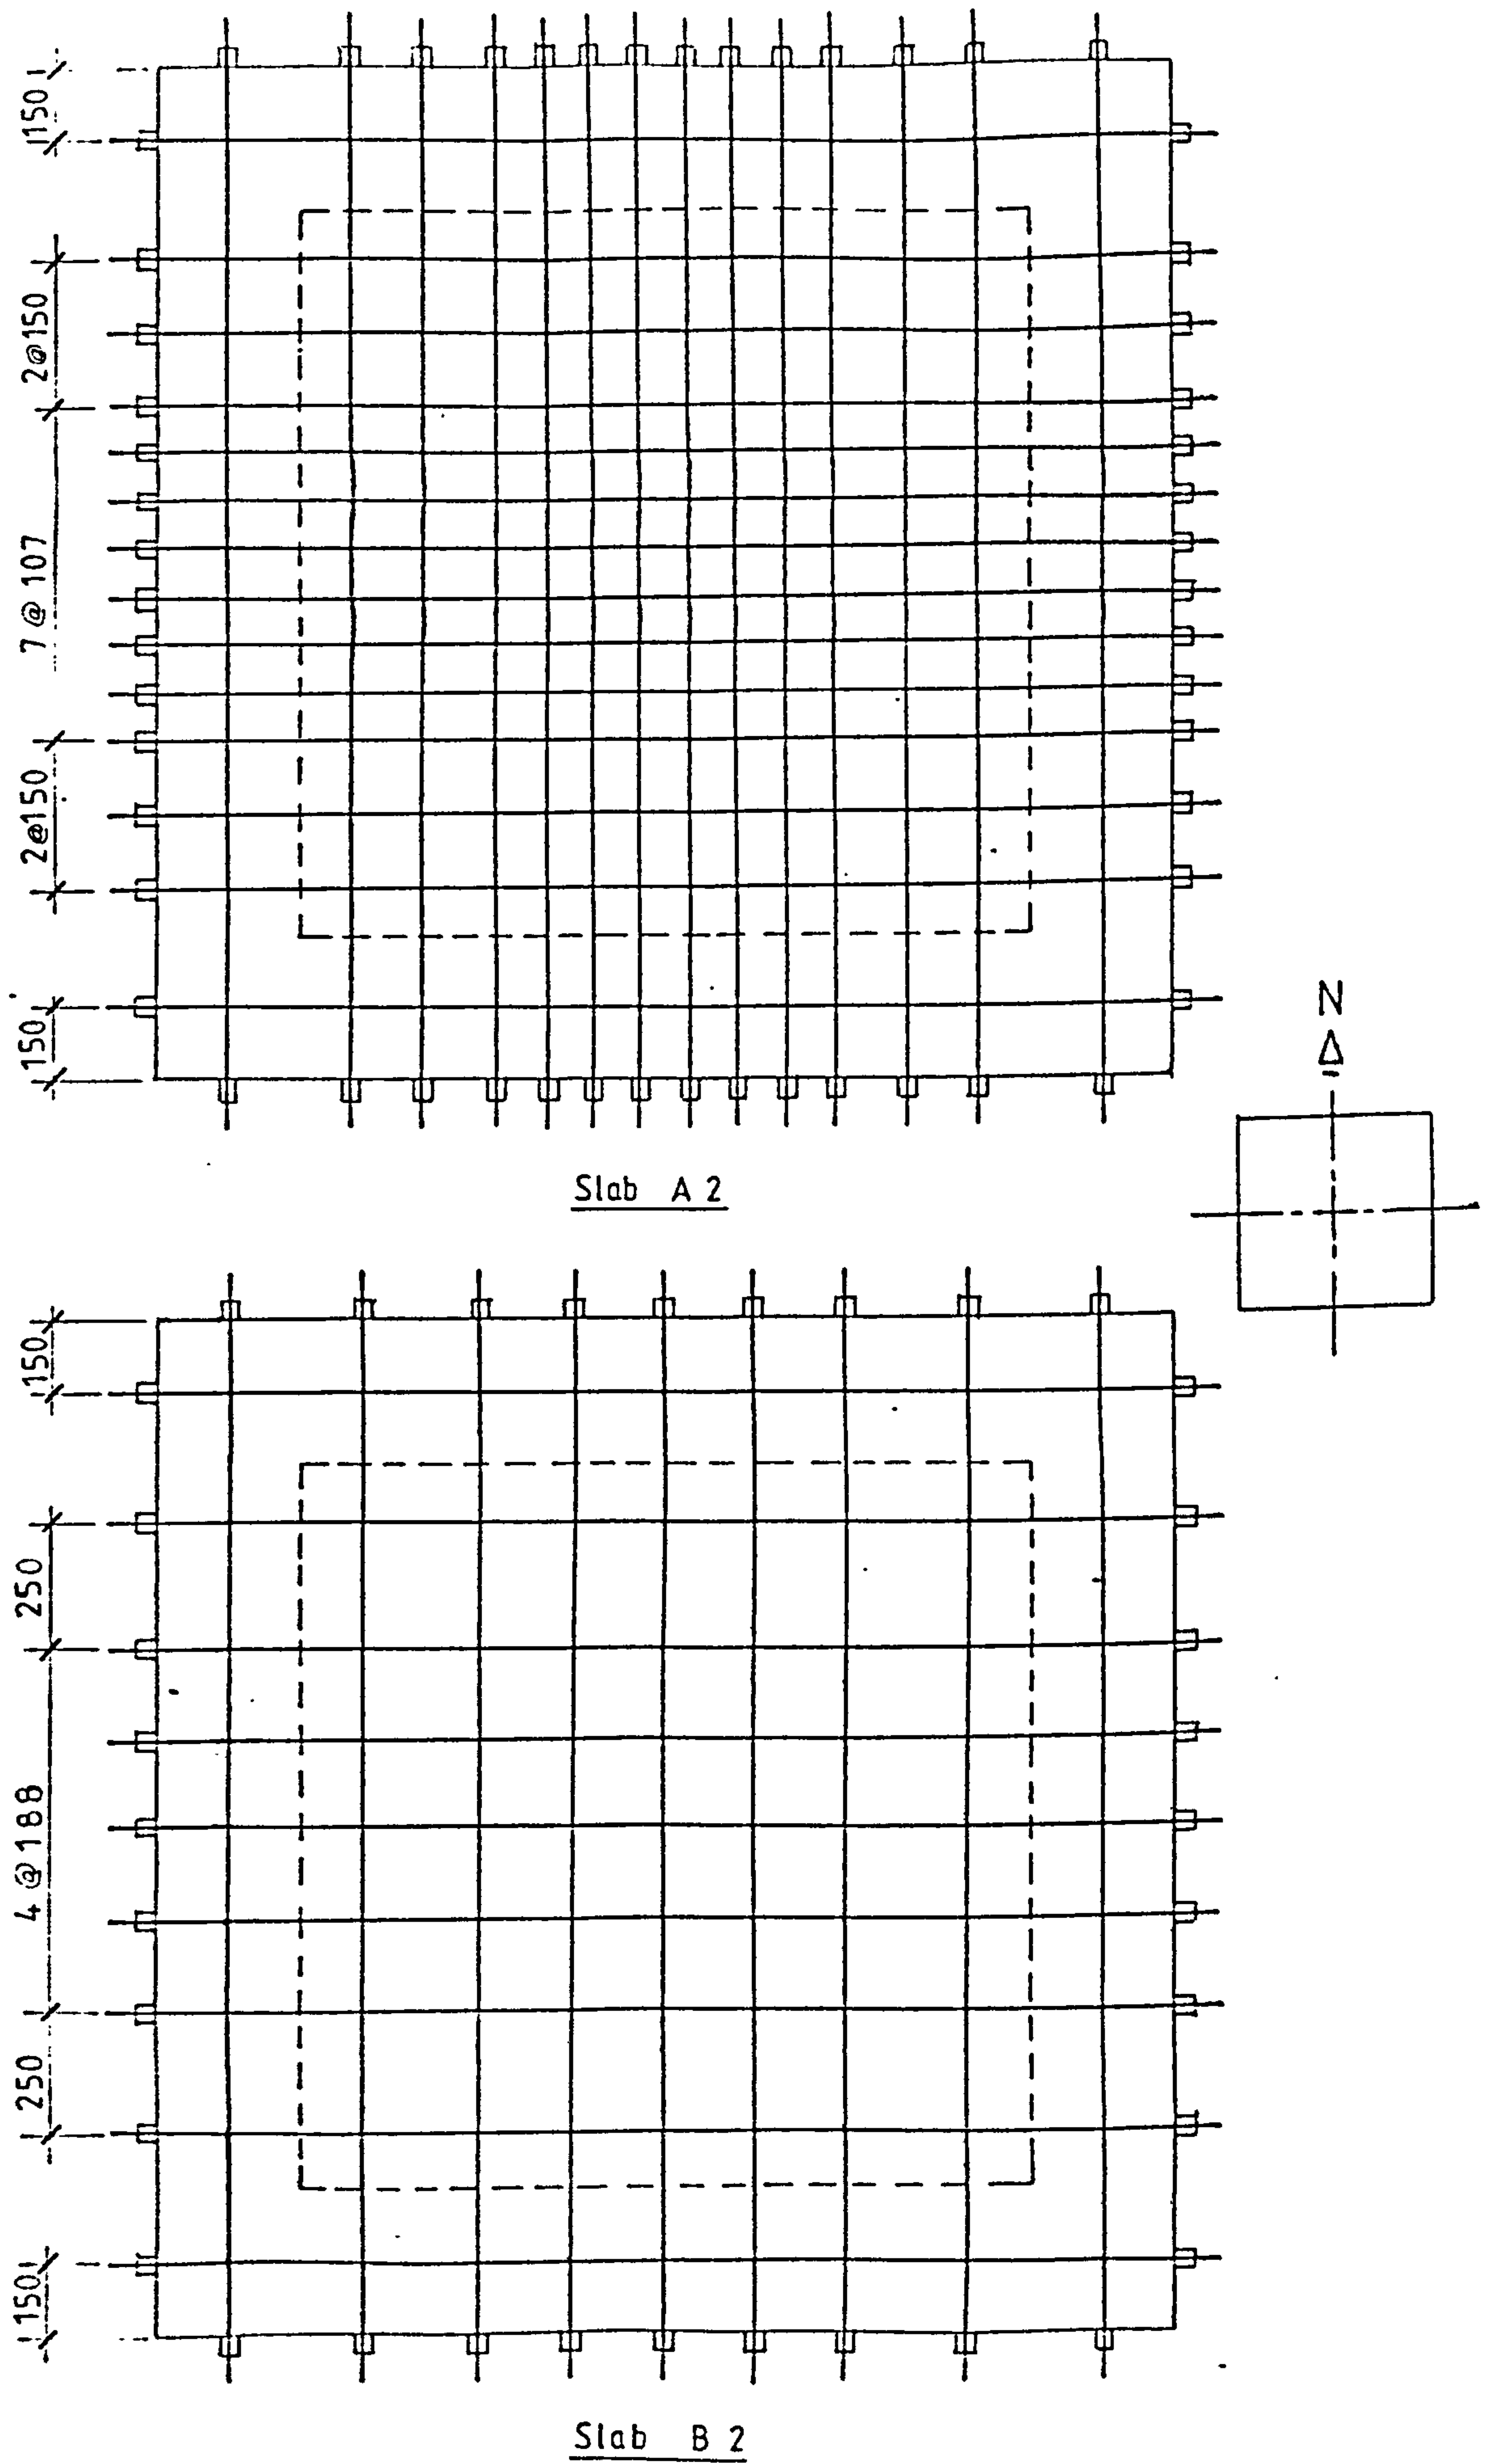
Tendon arrangement of slabs A2 & B2
